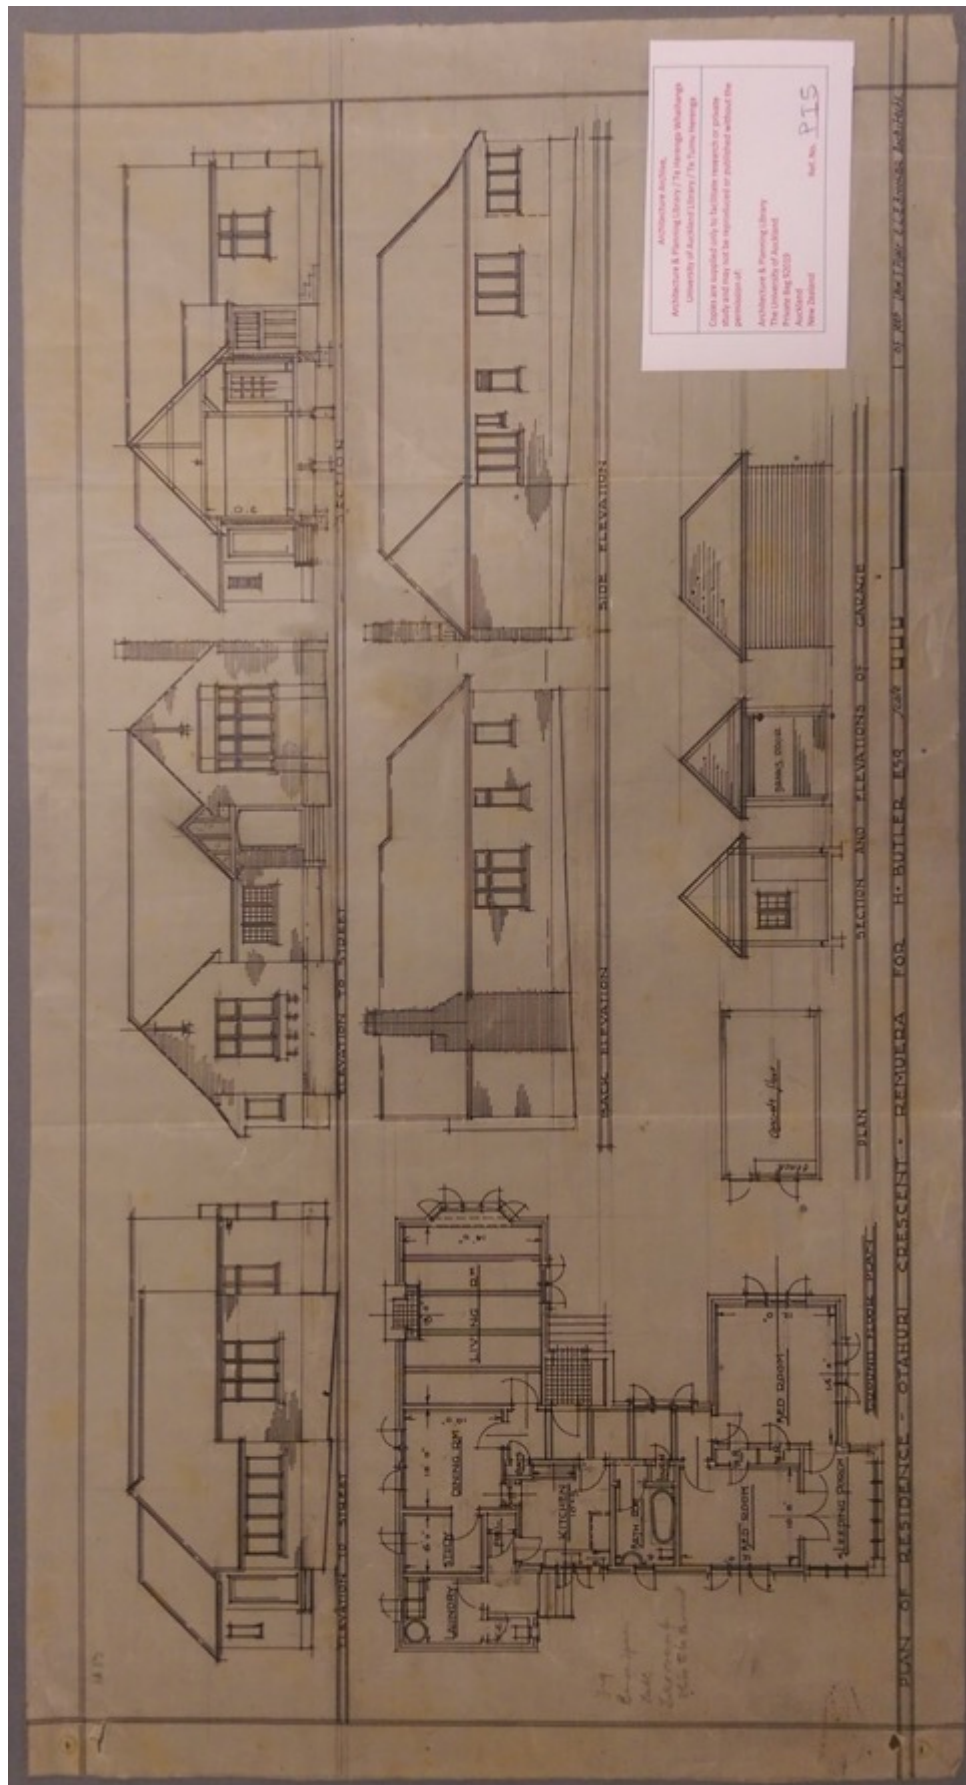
Architectural drawings showing the plan and elevations of the residence and garage at 3 Otahuri Crescent, 1931. The drawing shows the architects' names as Llew S. Piper and L. E. Brooker (PI5, Llew S. Piper Collection, Architecture Archive, University of Auckland Libraries and Learning Services).
